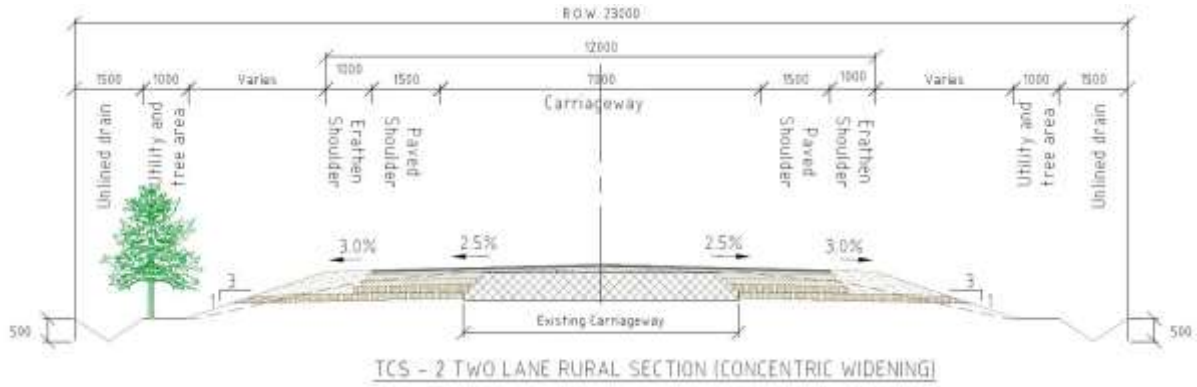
Two Lane Rural Section (Concentric Widening)
